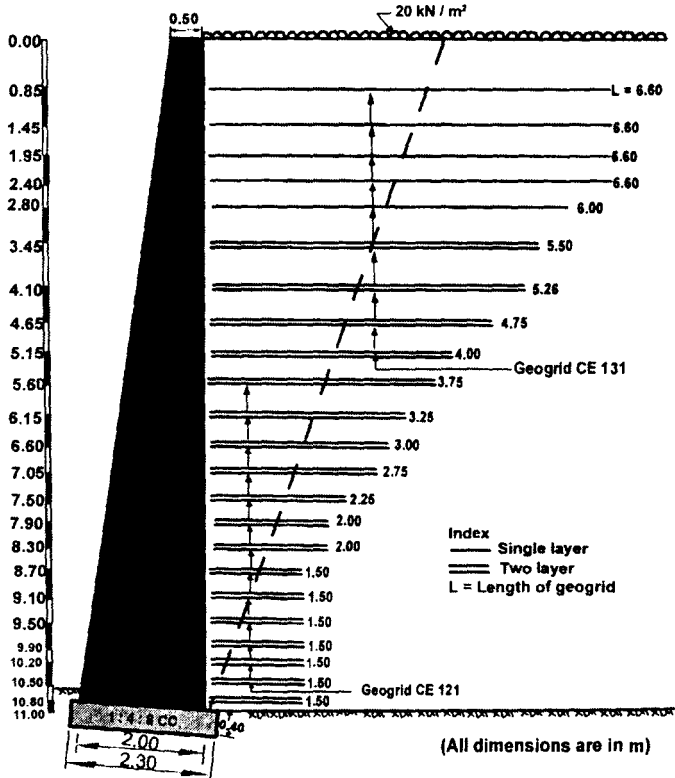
Cross-section of 11 m High Wall Retaining Geogrid Reinforced Cohesionless Backfill
